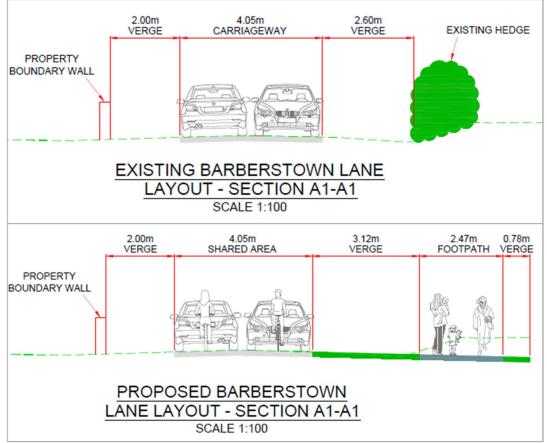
Existing and Proposed Cross Section Barberstown Lane North Access Road
